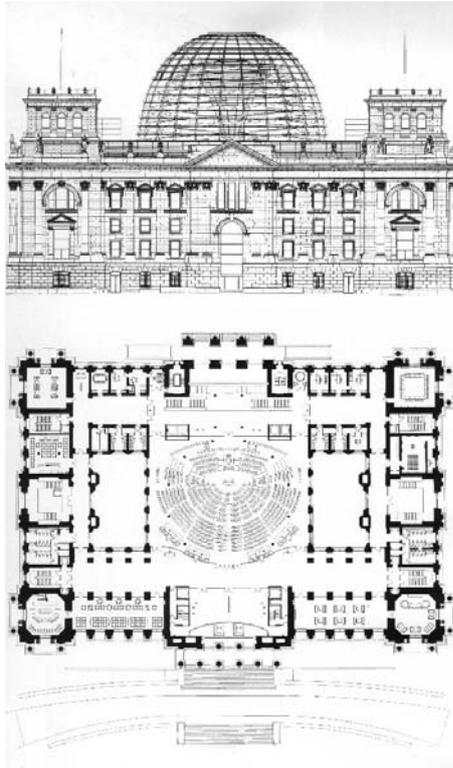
Reichstag plan and elevation (Azizoğlu and Erden 2000, p.89)
